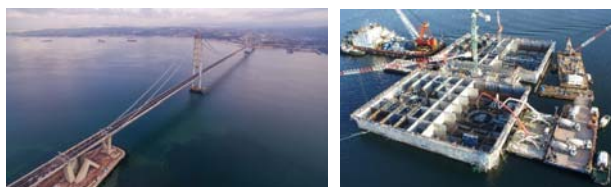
The Izmit Bay Bridge, Turkey; (a) overview; (b) Tower foundation caisson
